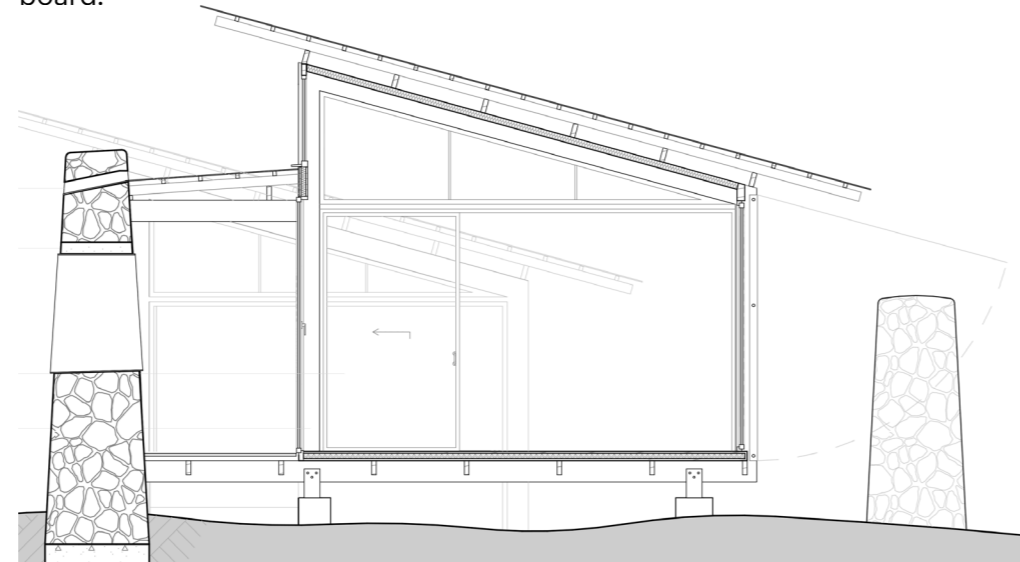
Structure: Interpretation space 2 section (Author,2021).
